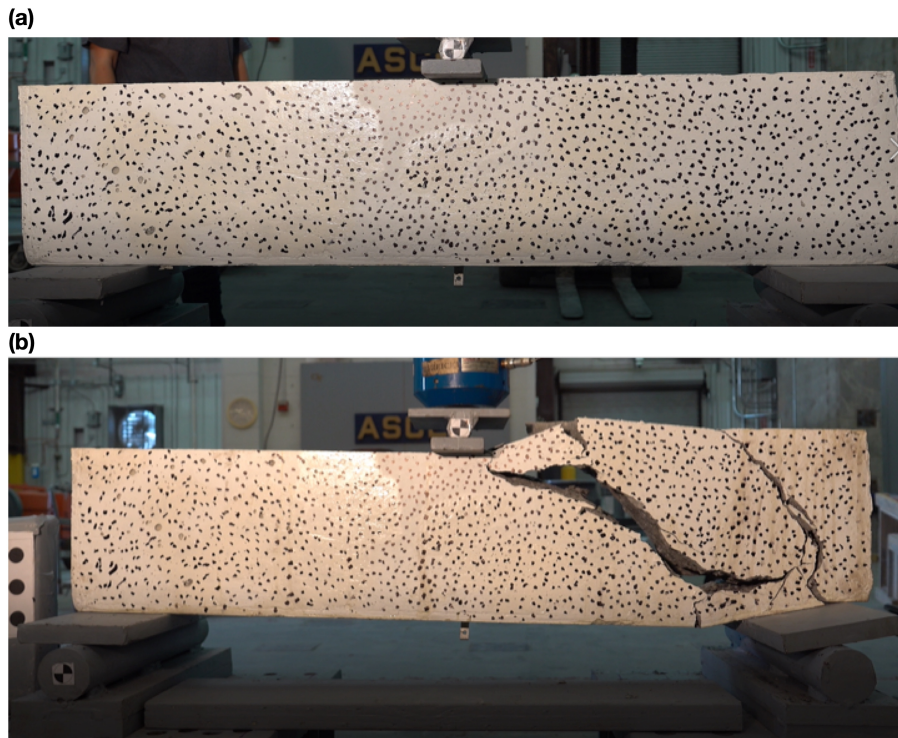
Behavior of reinforced concrete beam: (a) at minor crack development; (b) at failure.
